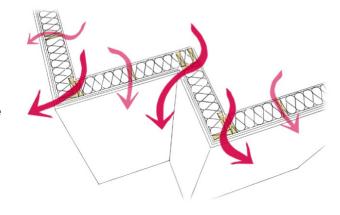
Thermally unbroken slab edges and other features of the building façade provide 'bridges' that conduct heat out of the building.
